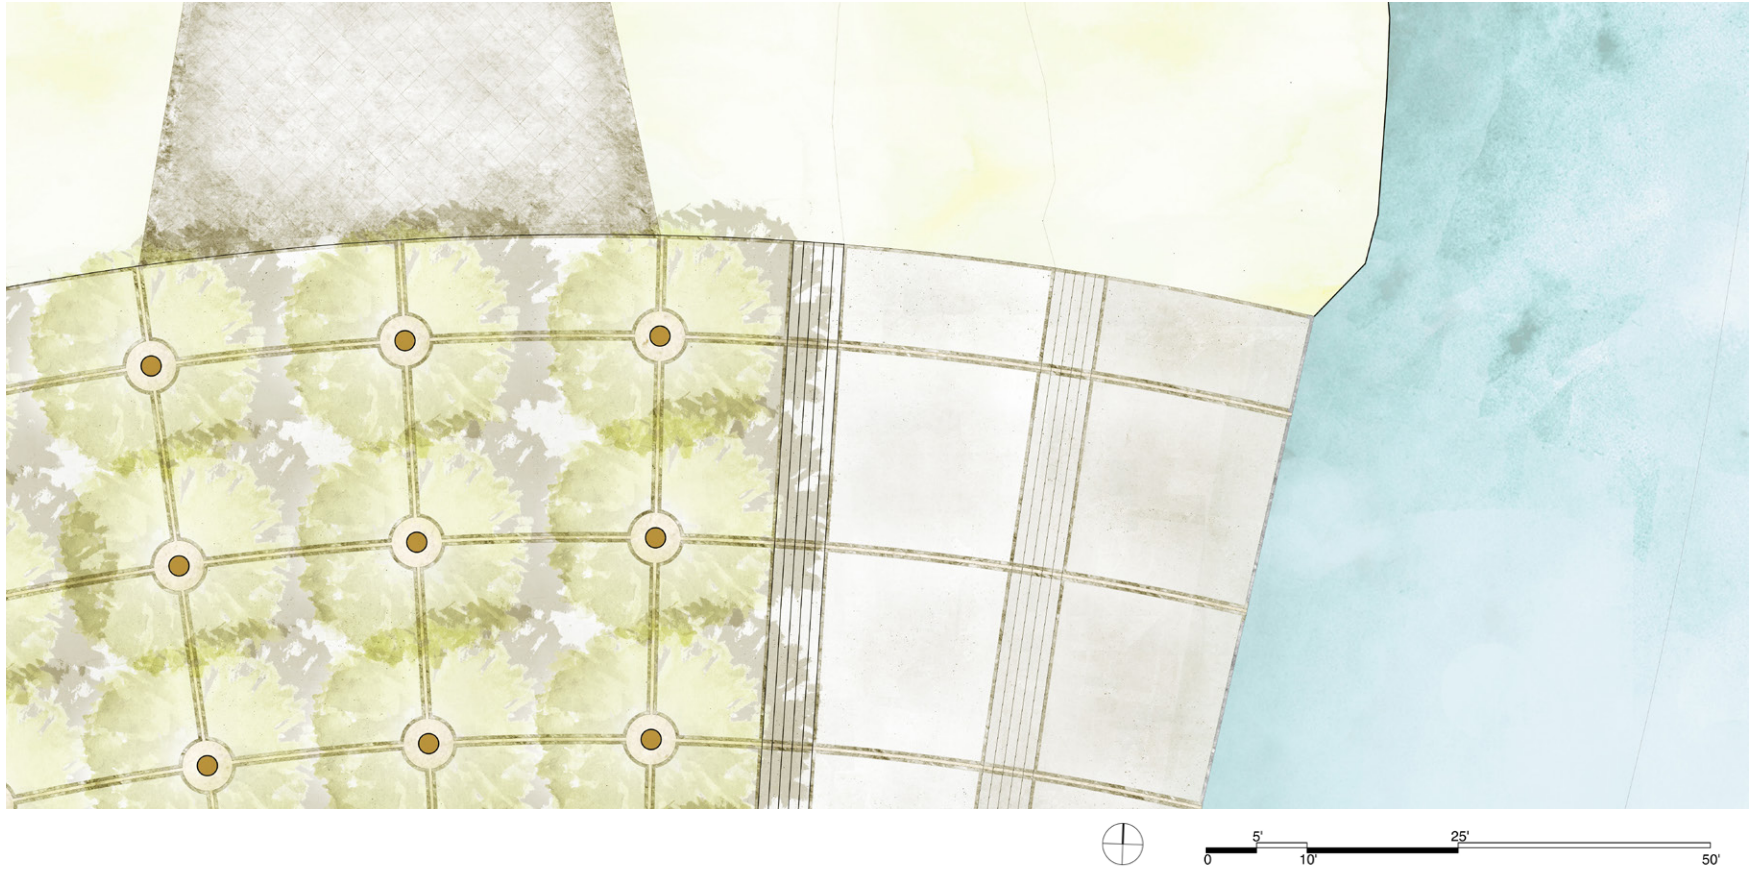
Zoomed in plan detail of the northeast part of the River Plaza; showing the connected tree pits draining into the river and the floor of the plaza - concrete bordered by stone along the tree pits
